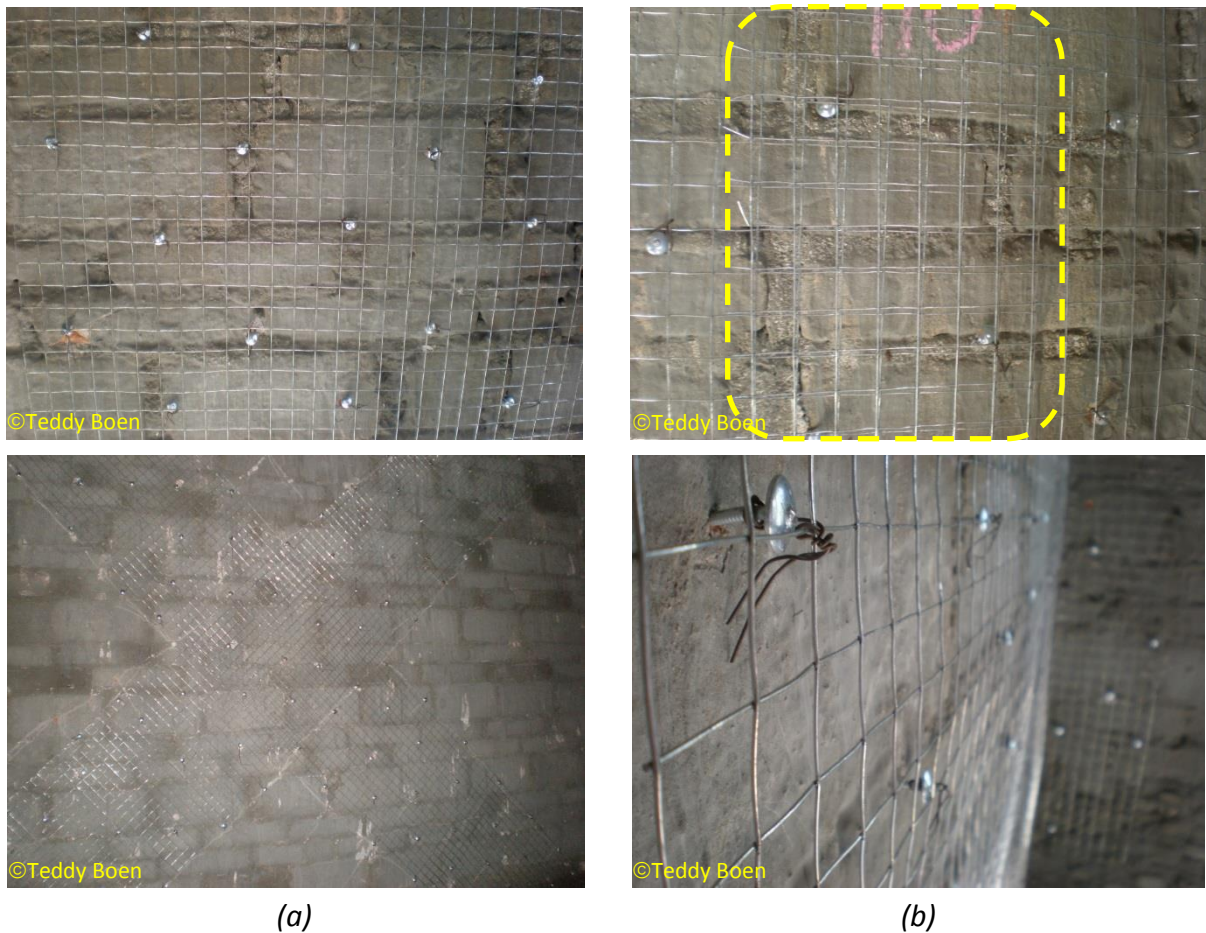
(a) Installation of Diagonal Wire Mesh; (b) Wire Mesh Installed and Fastened to Top of Umbrella-Head-Roofing-Nail
